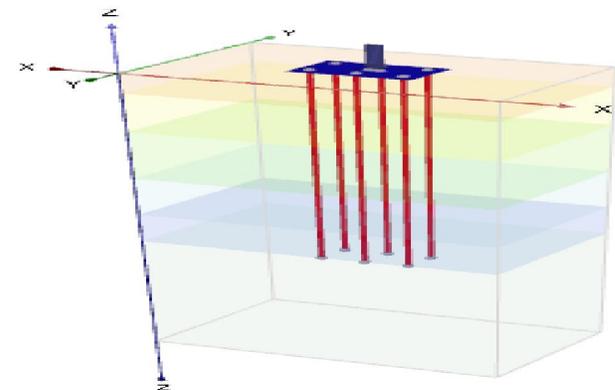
PLAN IN 3-D FOR SIX PILES WITH RAFT (LP=34D, SP=3D, D=0.6 M)
